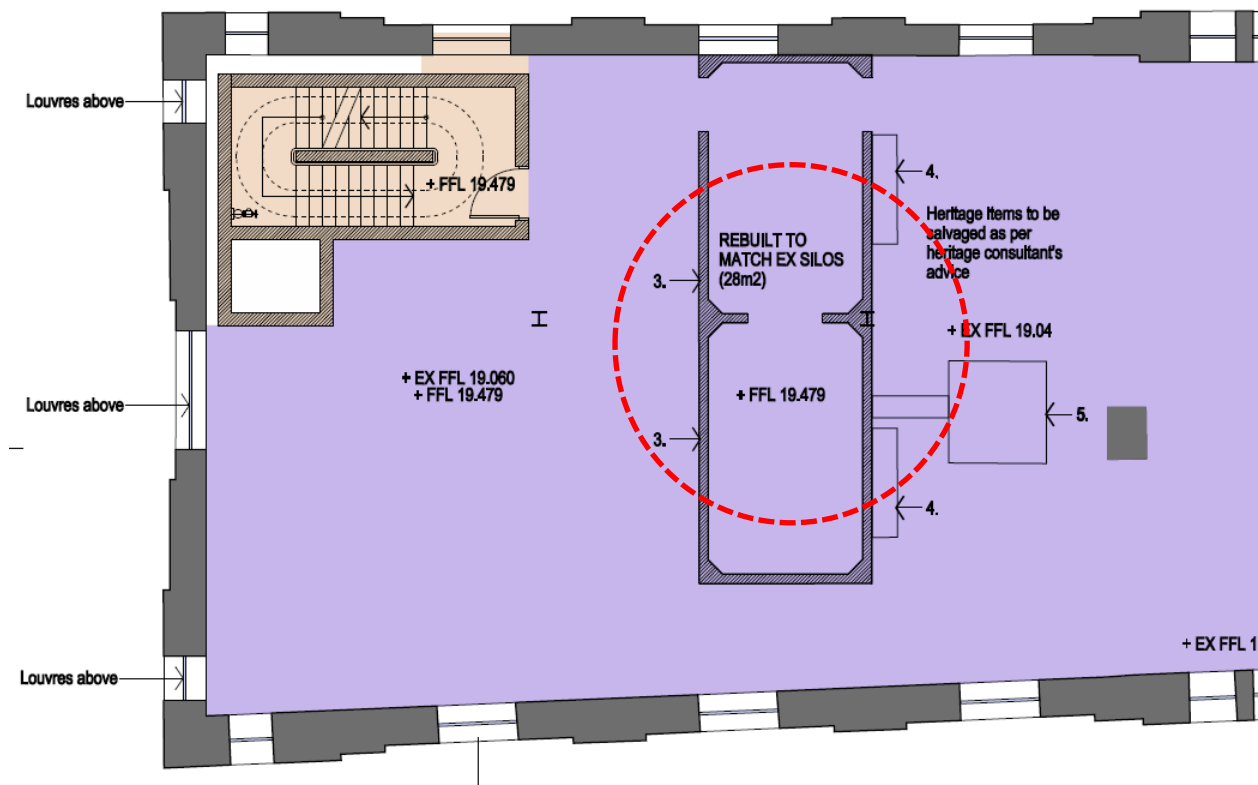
Extract of Level 1 Proposed Plan – proposed silo reconstruction / interpretation circled
